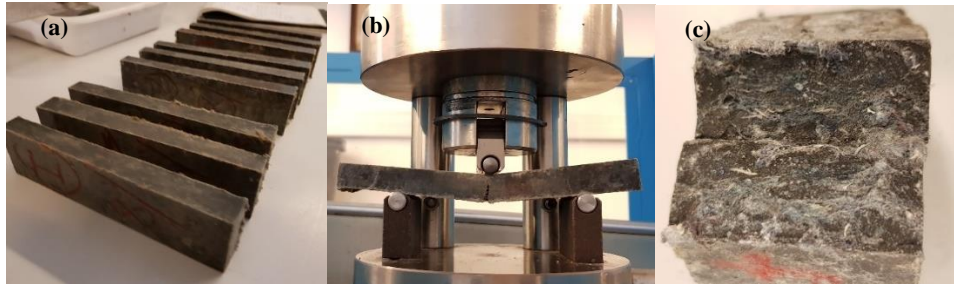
Flexural tests set-up: (a) 20x40x160 mm specimens; (b) flexural test configuration; (c) cross-section of a tested-to-failure specimen
